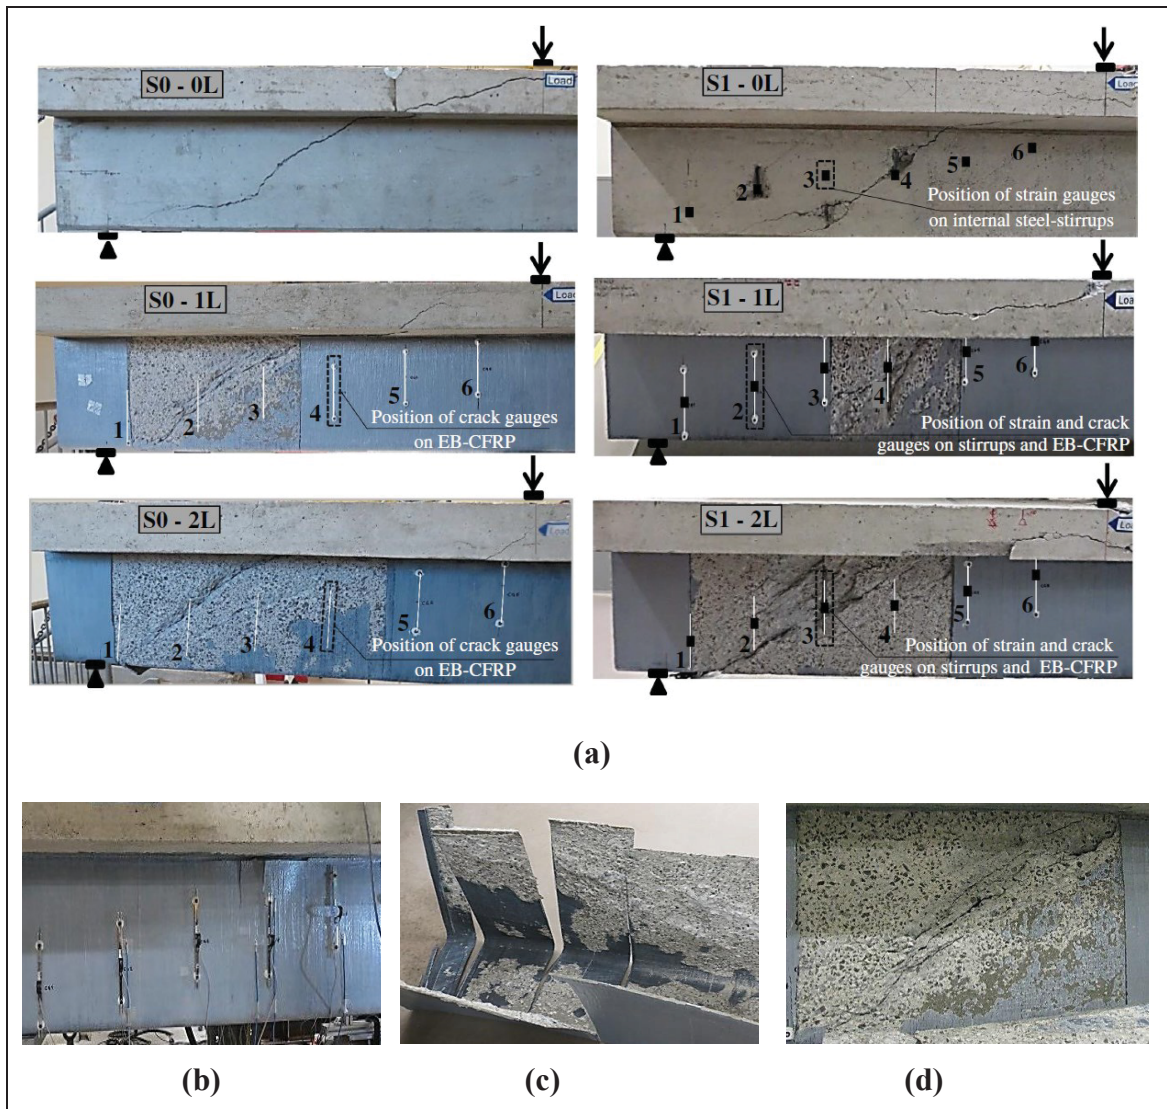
Shear failure mode: (a) cracking patterns for specimens with and without steel stirrups; (b) delamination of EB-CFRP; (c) concrete layer attached to debonding CFRP; and (d) concrete pulverization around diagonal shear cracks (after removal of CFRP)
